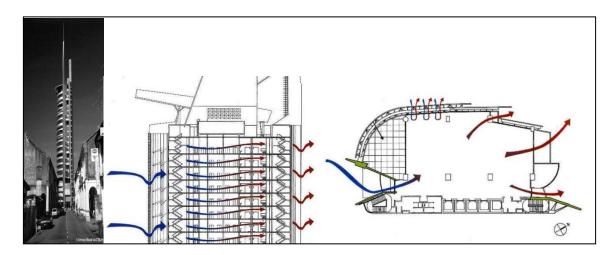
19: UMNO tower, section and Plan (wing wall technique) (Salib & Wood, 2013)
